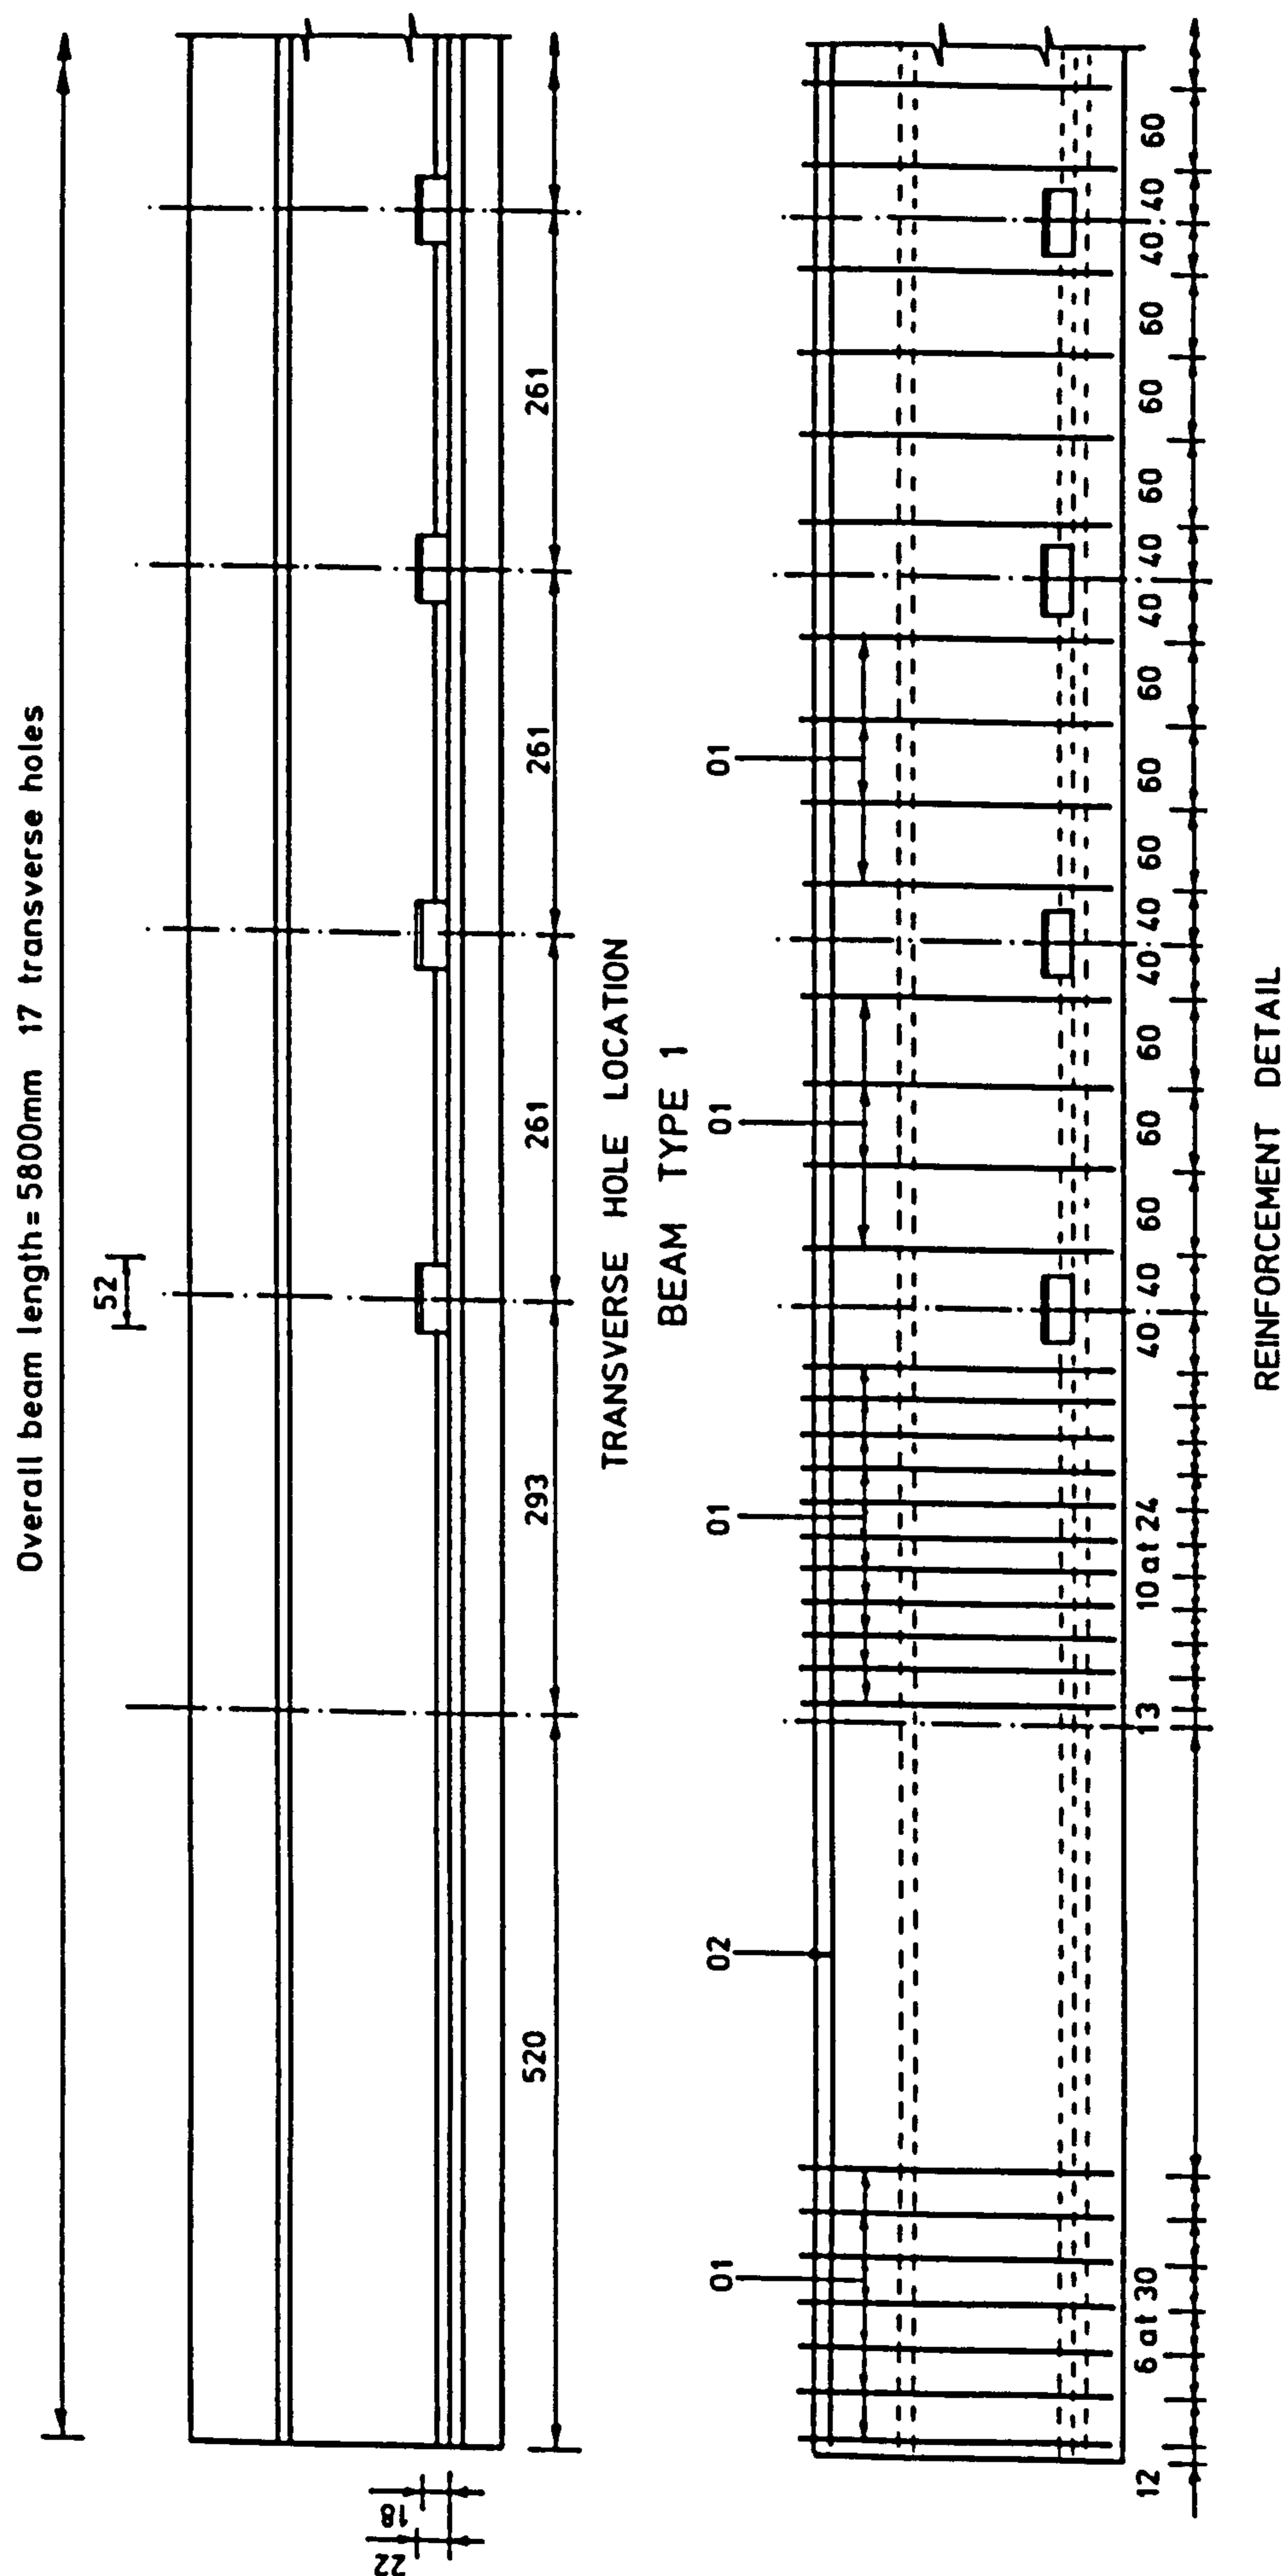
DETAILS OF MODEL DECK 2, PRECAST BEAM TYPE 1 TRANSVERSE HOLE AND SHEAR REINFORCEMENT LAYOUT.
